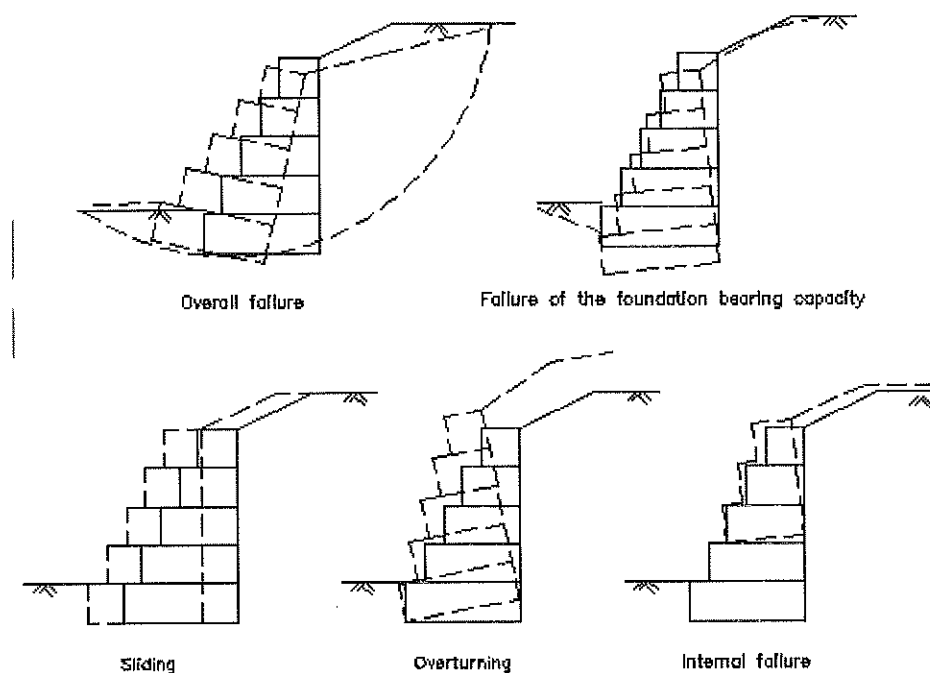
Possible types of failure which may occur in gabion retaining walls
